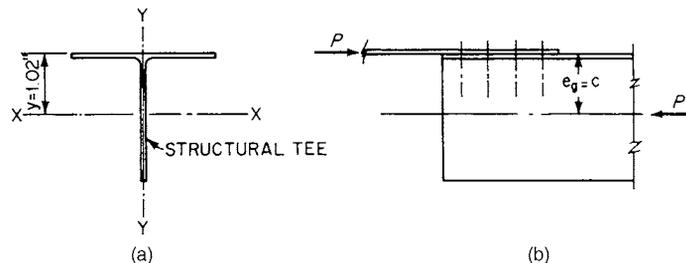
Diagonal brace. (a) Cross section. (b) Eccentric loading on end connection of the diagonal.
